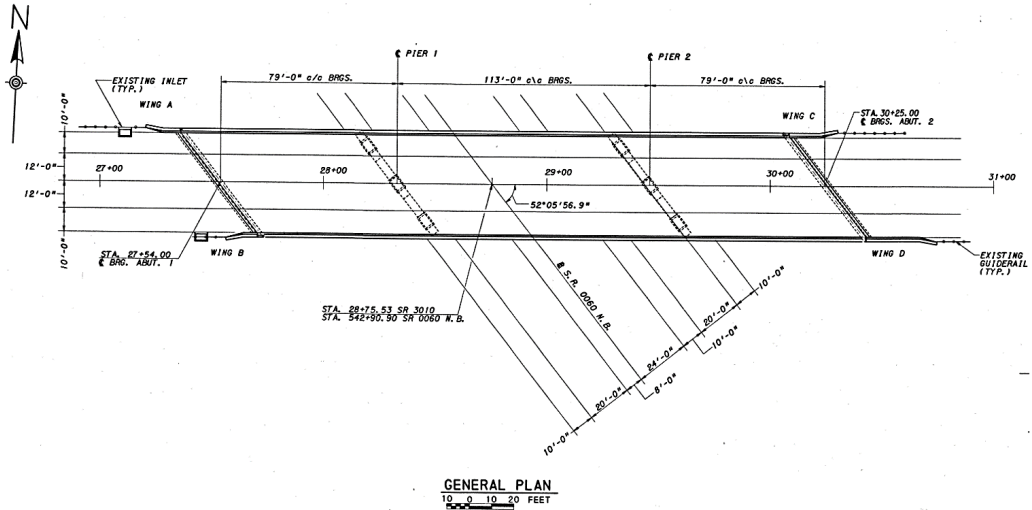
As-Built Plan (Plan View) Bridge No. 22451
